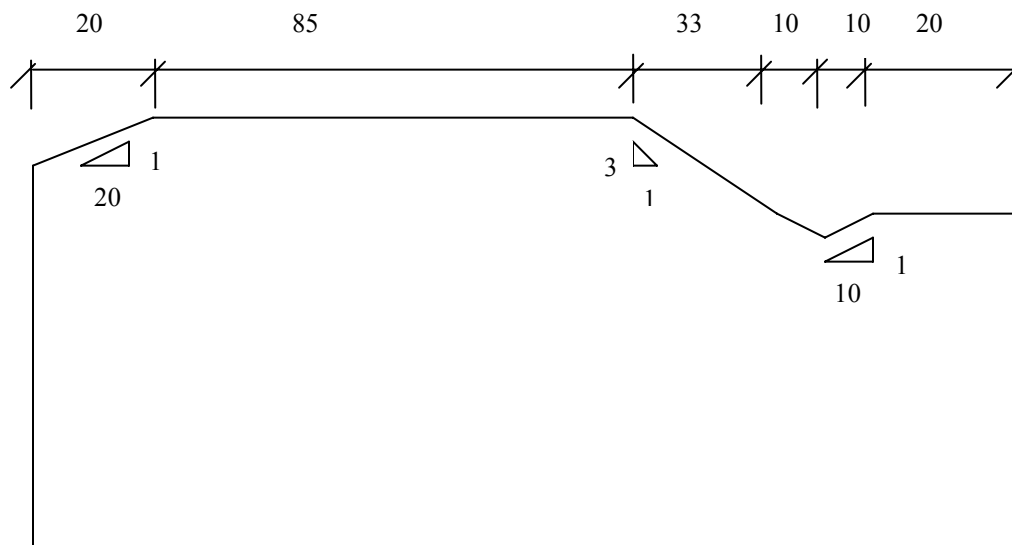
Fort Worth North Loop 820 Study Section A Pavement Cross Section Sketch.
